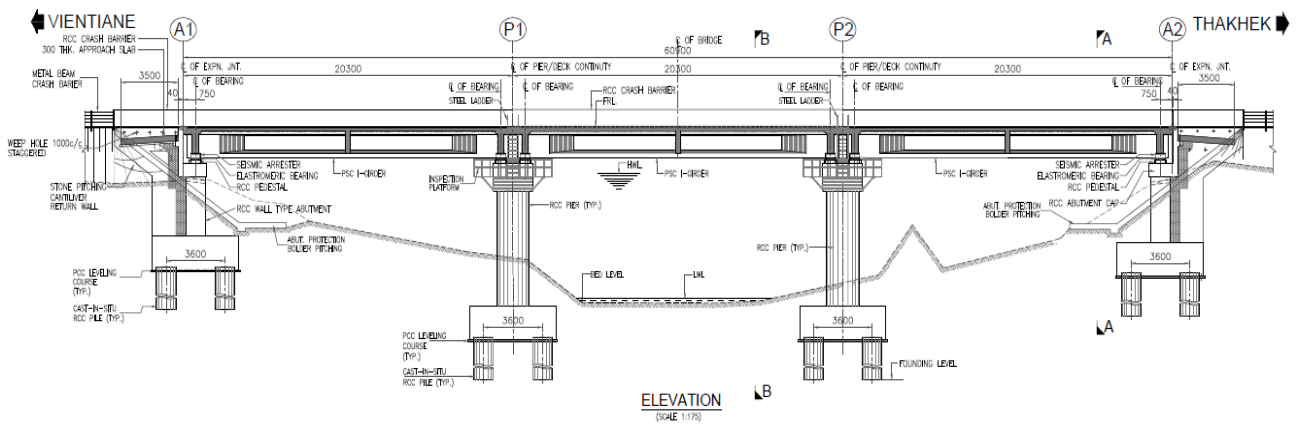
Bridge Spans of Houay Deua2 Bridge
